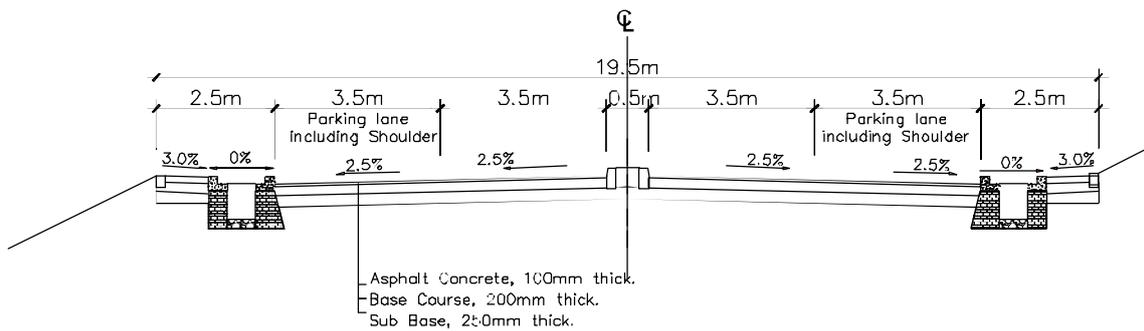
Proposed Typical Cross Section (D/Markos Town Center Section)
